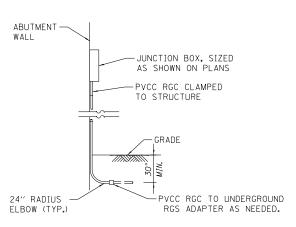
DETAIL A (EAST FACE OF SOUTH ABUTMENT) N.T.S.
